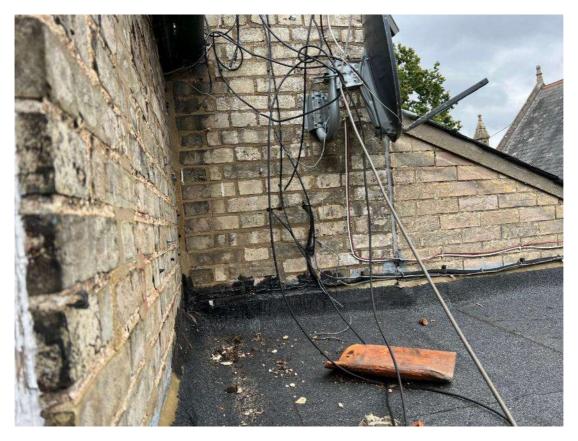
Building 3 (ref B3B). Shows flat roof of building B3B adjoining eastern aspect of building B3A.
